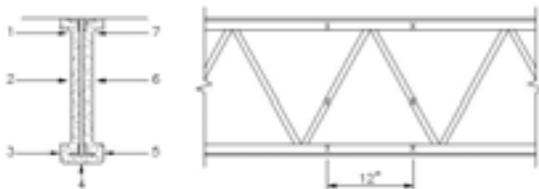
SFRM Thickness Measurement Locations at Joists
